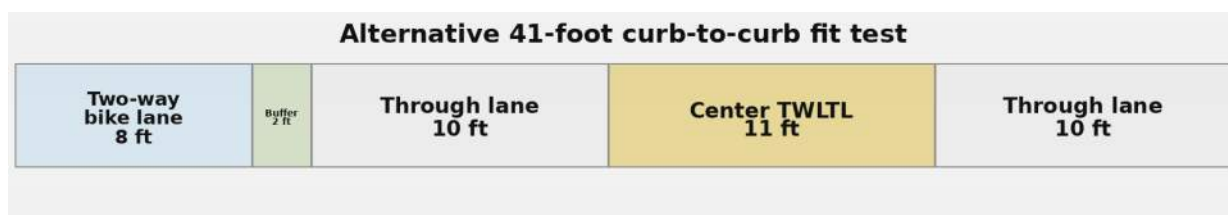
A. Alternative 41-foot curb-to-curb fit test showing an 8-foot two-way bike lane, 2-foot buffer, two 10-foot through lanes, and an 11-foot center TWLTL. This concept fits within 41 feet on paper and illustrates a more separated side-bikeway option, but it would require special intersection and driveway design because one direction of bicycle travel operates opposite the adjacent motor-vehicle lane.
